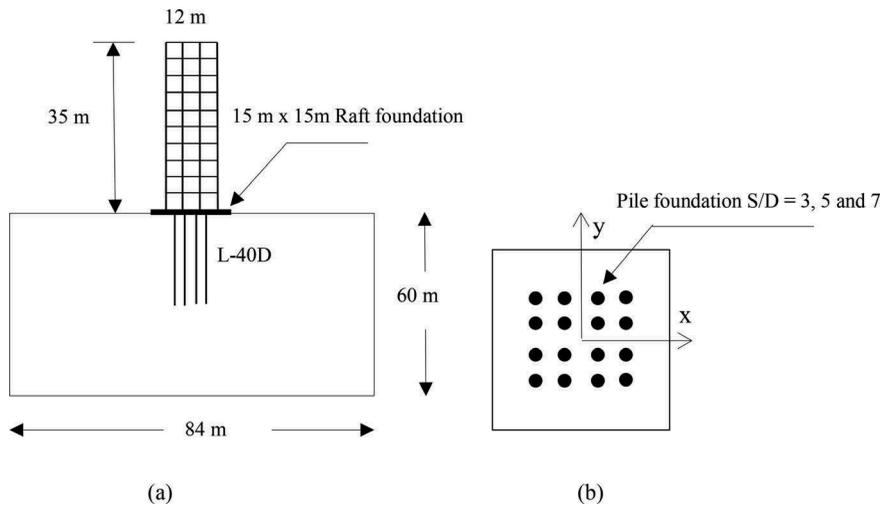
(a) Elevation and (b) Plan view of 4 x 4 Pile foundation arrangement
